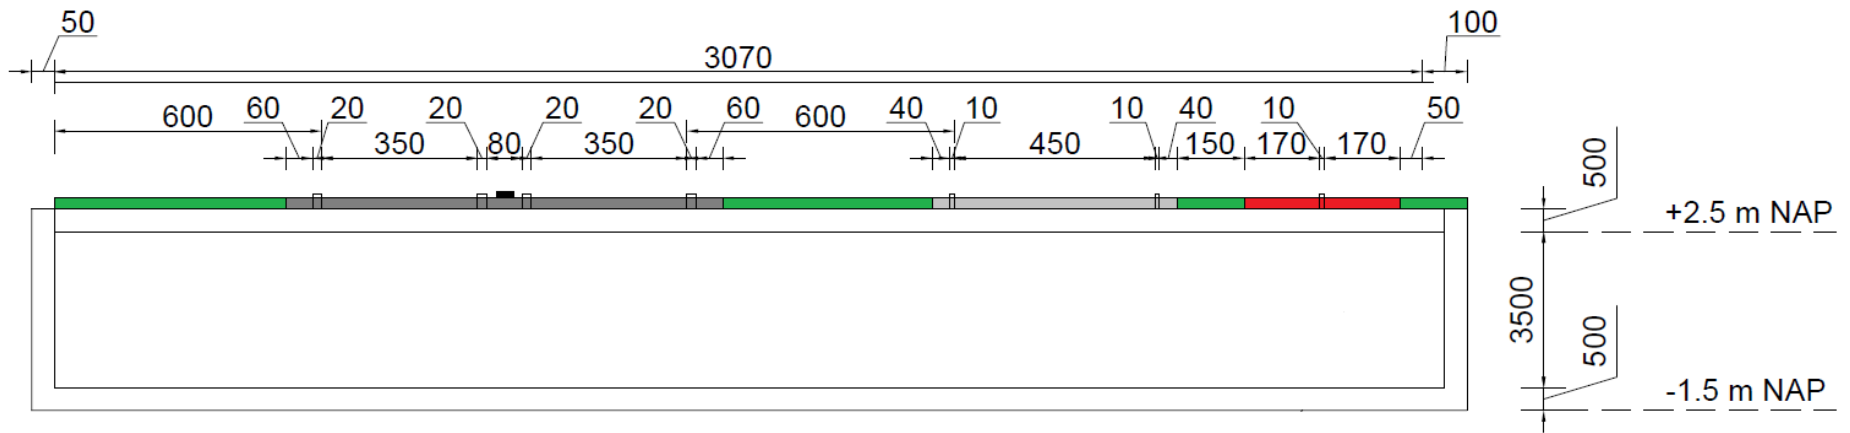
TRANSVERSE CROSS-SECTION BALLAST HOUSING (DIMENSIONS IN MM)
